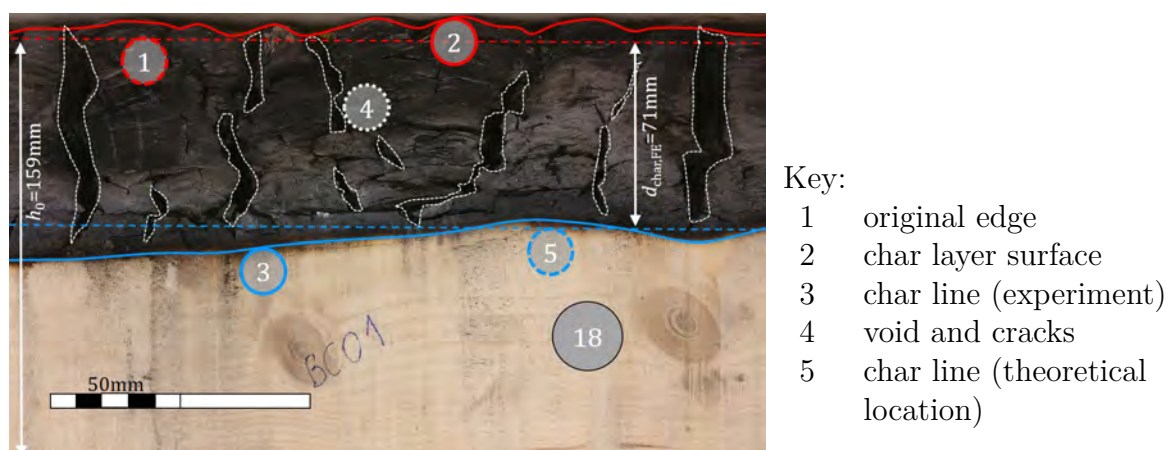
Length section of beam 18 (specimen BC1) after fire exposure. Own image.
